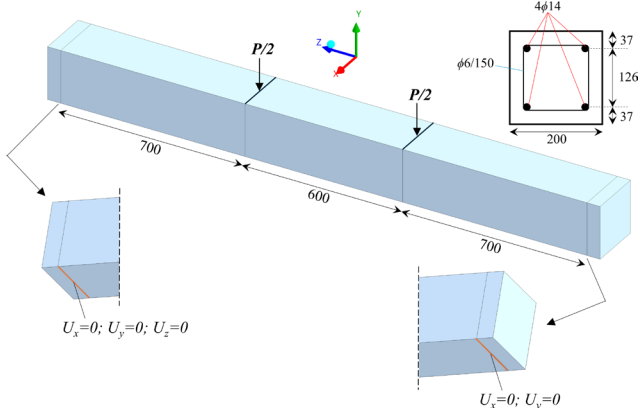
The cross-sectional details, loading and boundary conditions of Beam A1
